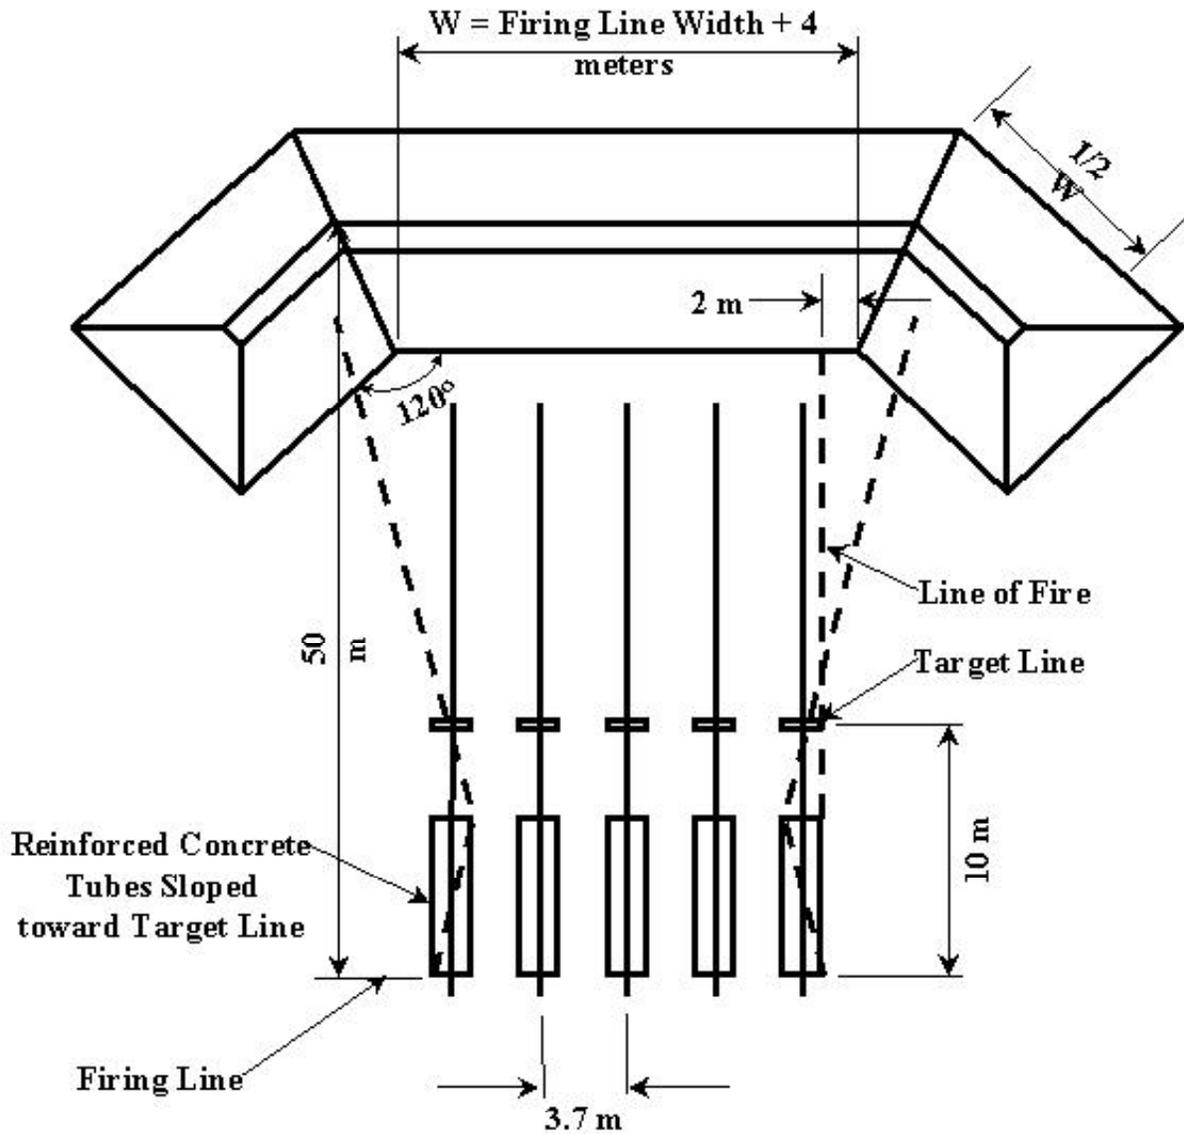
M60 Machine Gun, 10-Meter Tube Range Typical Range Configuration
